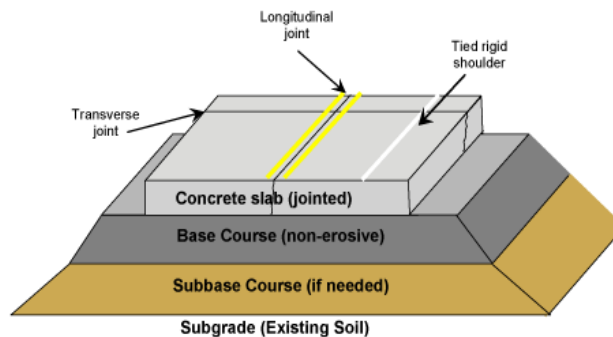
A typical section for a rigid pavement (Pavement Design Guide, 2006).
